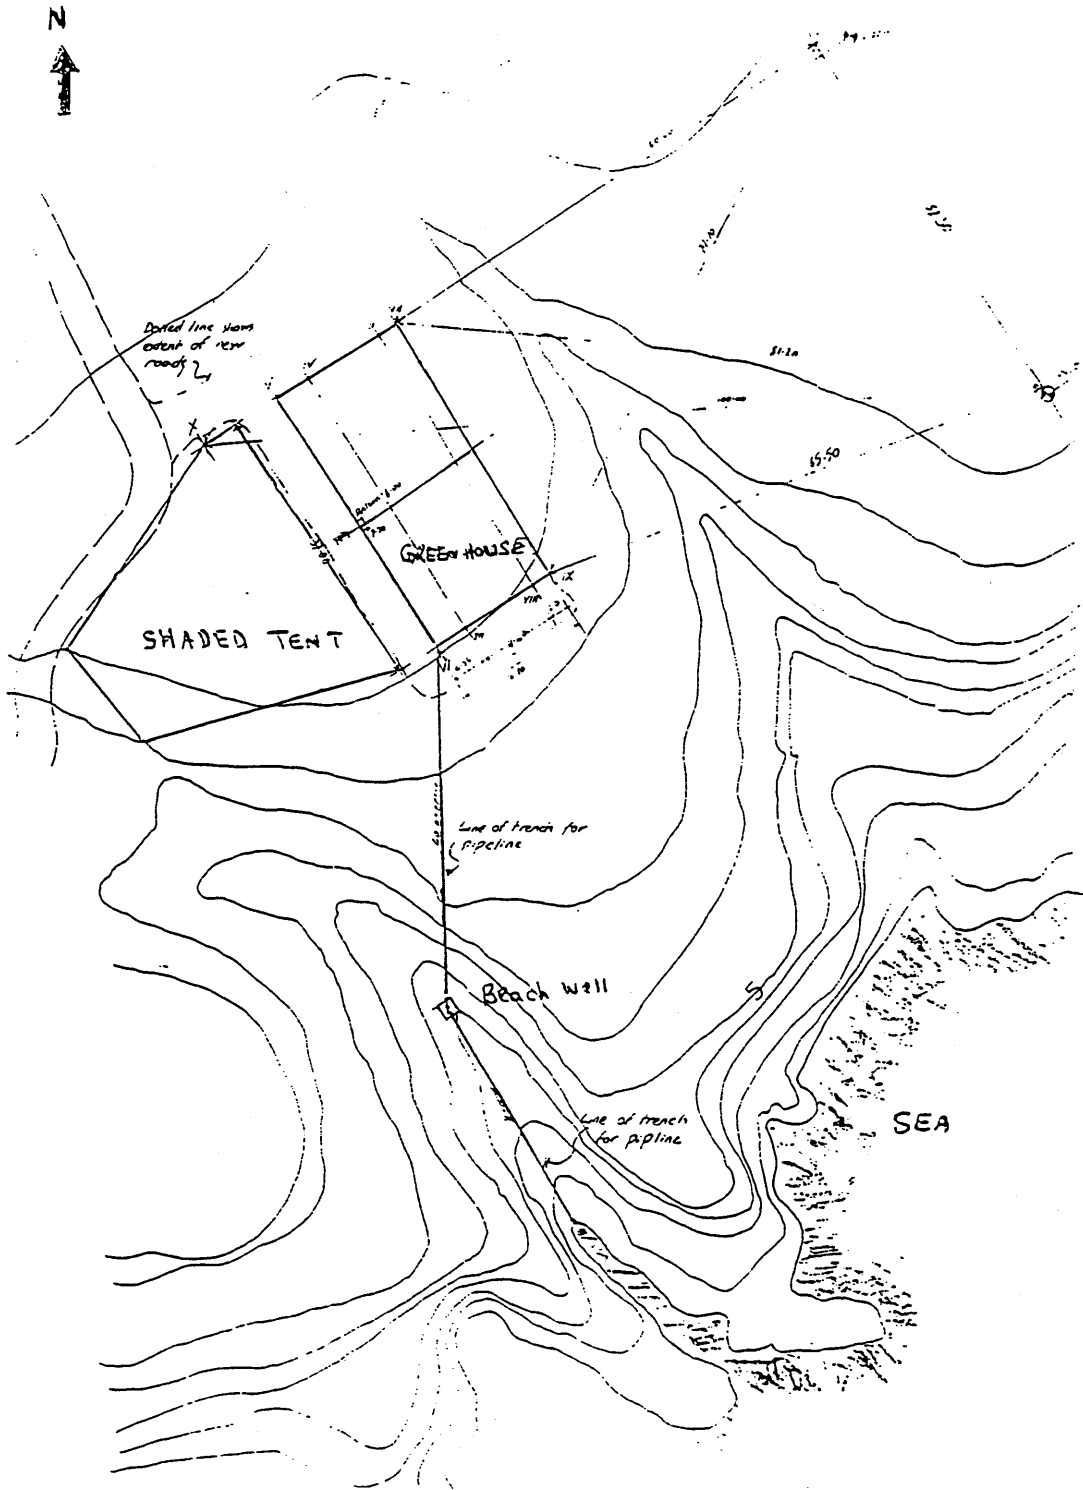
1 Greenhouse location (light works Ltd, 1995)
